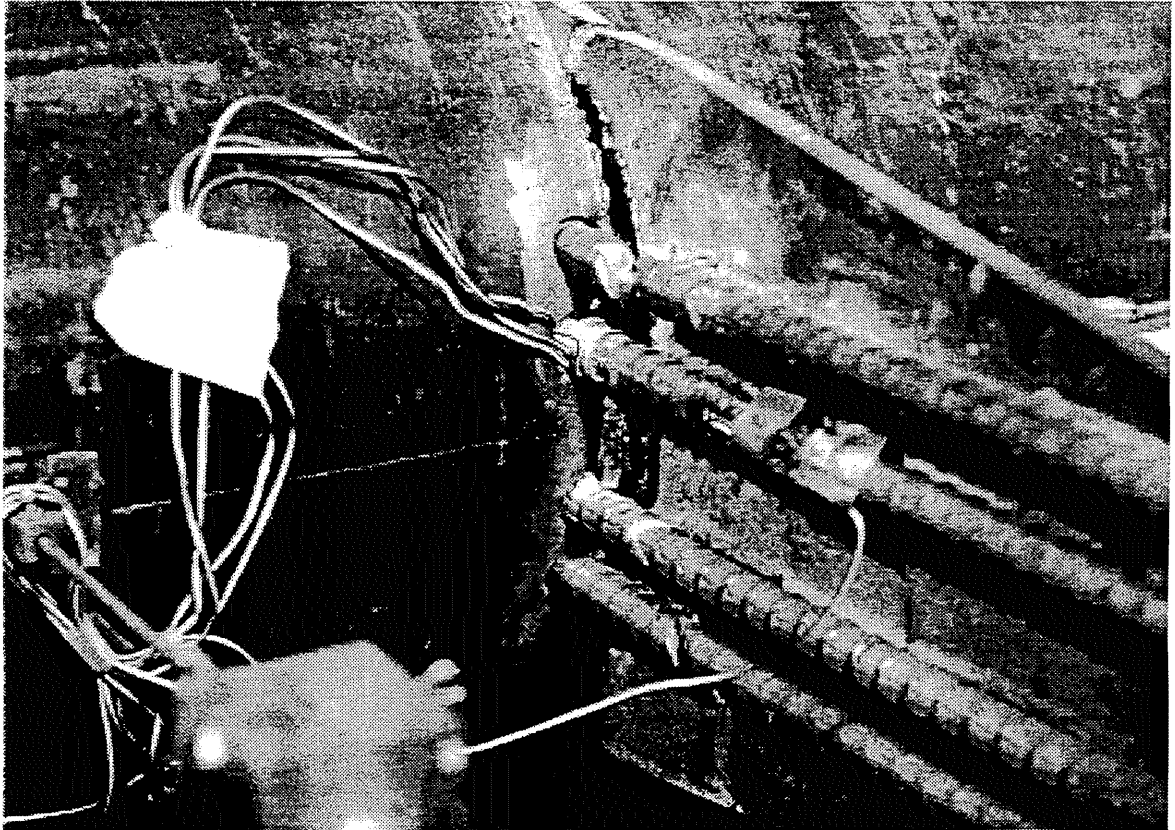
a. Failure of Connection *Type III*: Deformed Bar Failure
